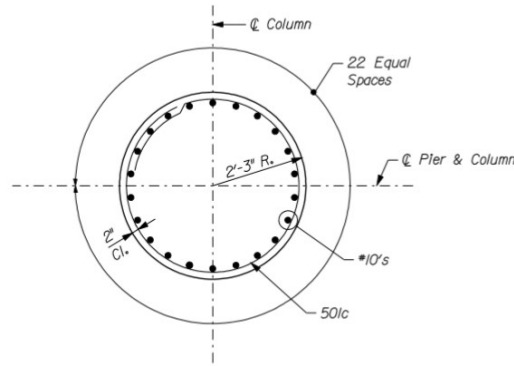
Typical Cross-Section of Column (NBI 50795) (2009)
